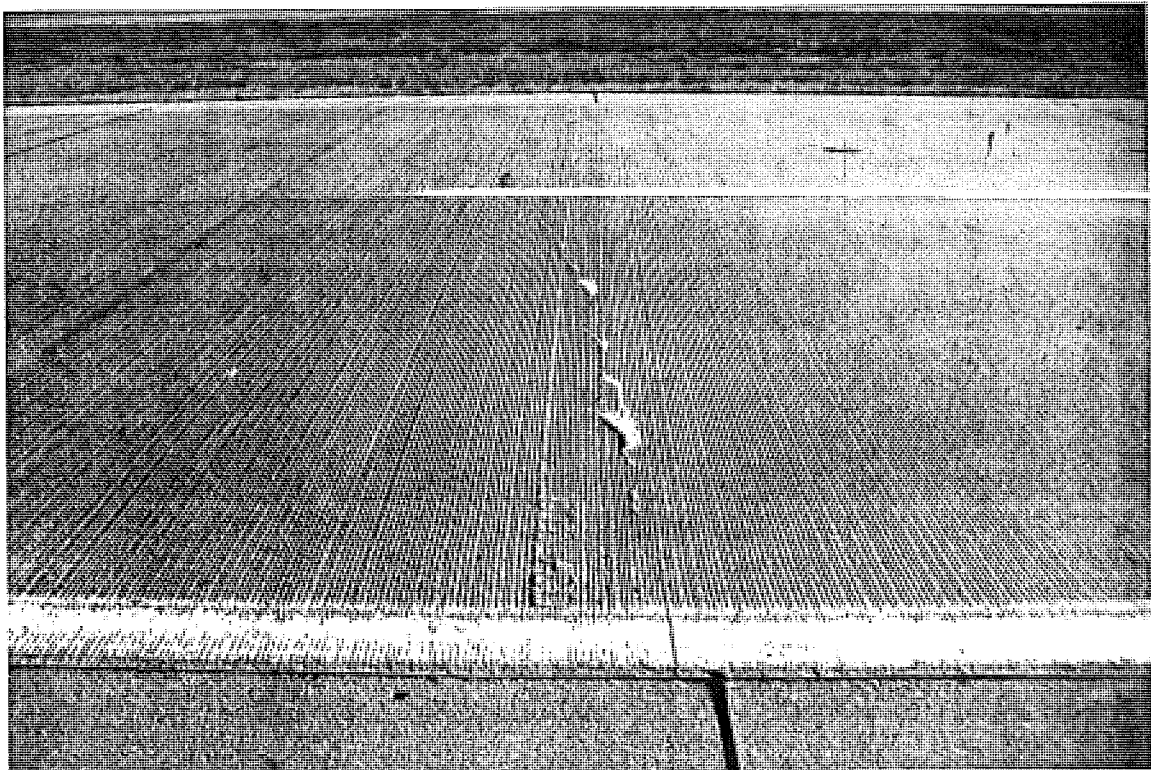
A third point crack that is spalling on CSN# 44044-18804A WB.
